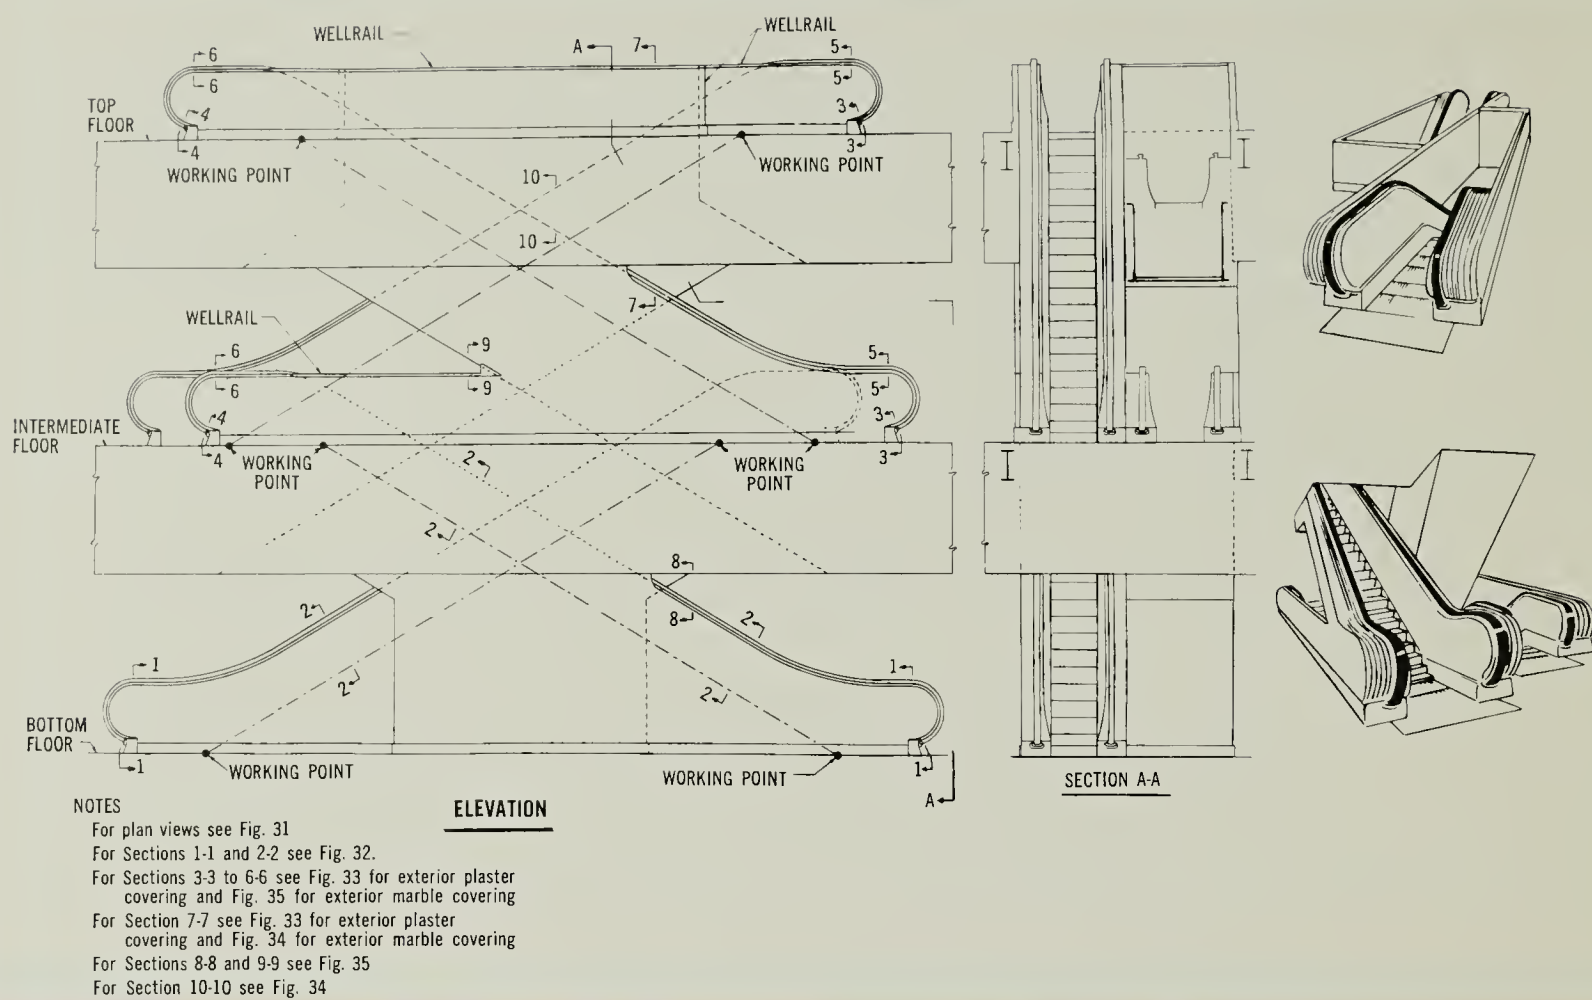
Criss-Cross Arrangement-Wellway Railing Elevation
